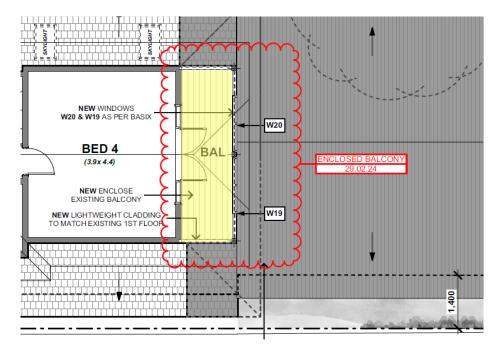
Architectural Drawings S4.55 – Rev J 29.02.24 – By ERA. Showing proposed enclosed balcony to rear 1<sup>st</sup> floor 'Bedroom 4'
